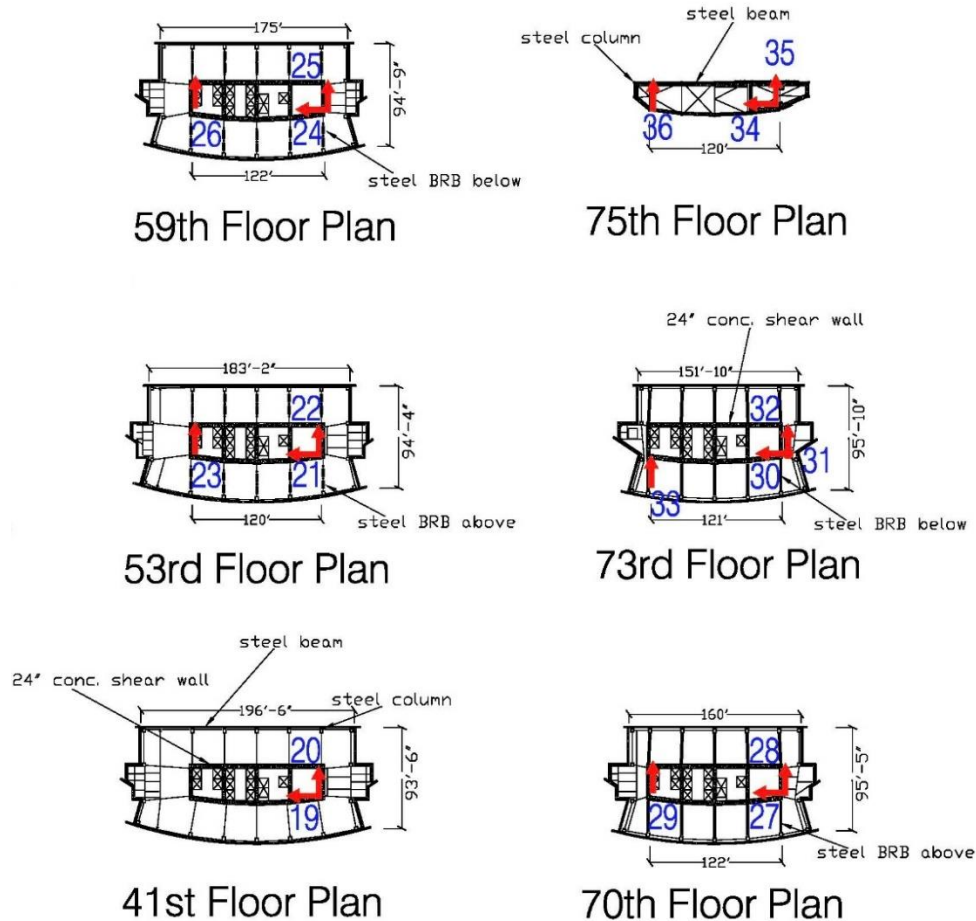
Sensor locations at the 41st Floor and above at Wilshire Grand Tower.
